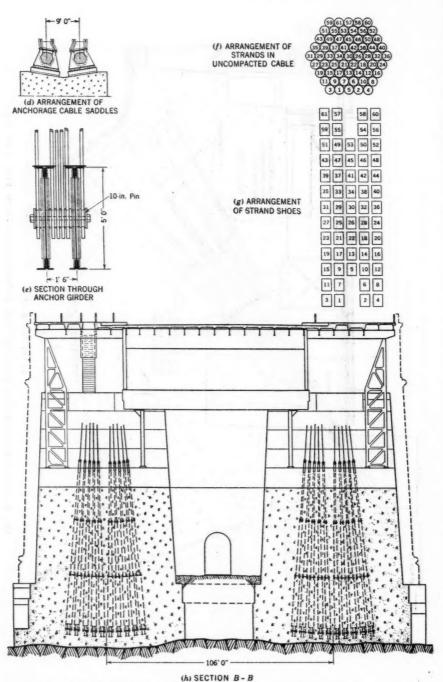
TYPICAL SECTIONS, NEW YORK ANCHORAGE (SEE, ALSO, FIGS. 4 AND 5).
